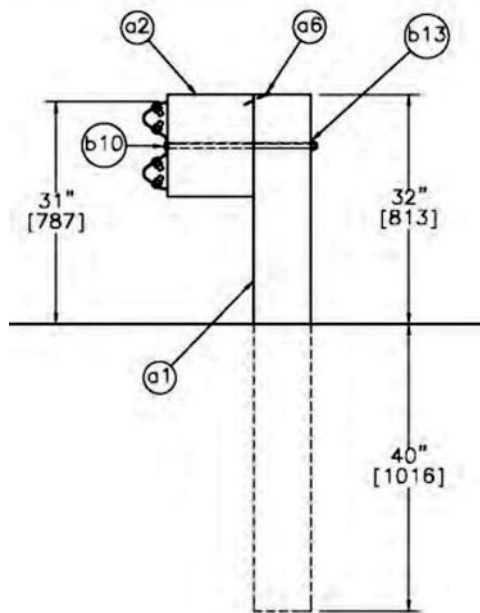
shows a section view of the round wood post guardrail system with a 36-inch embedment.
